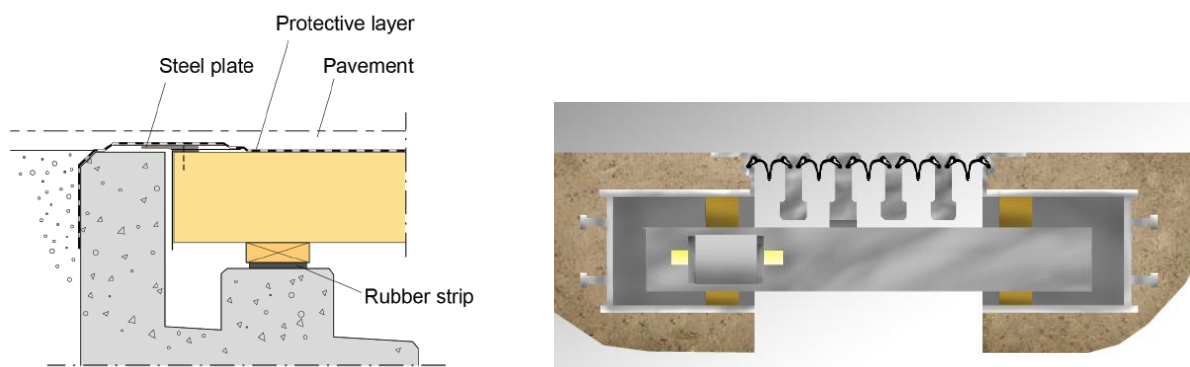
Left: Detail of the support of a timber bridge (note the simplicity of both bearing and expansion joint). Right: typical expansion joints for large movements suitable for steel bridges and concrete bridges.
